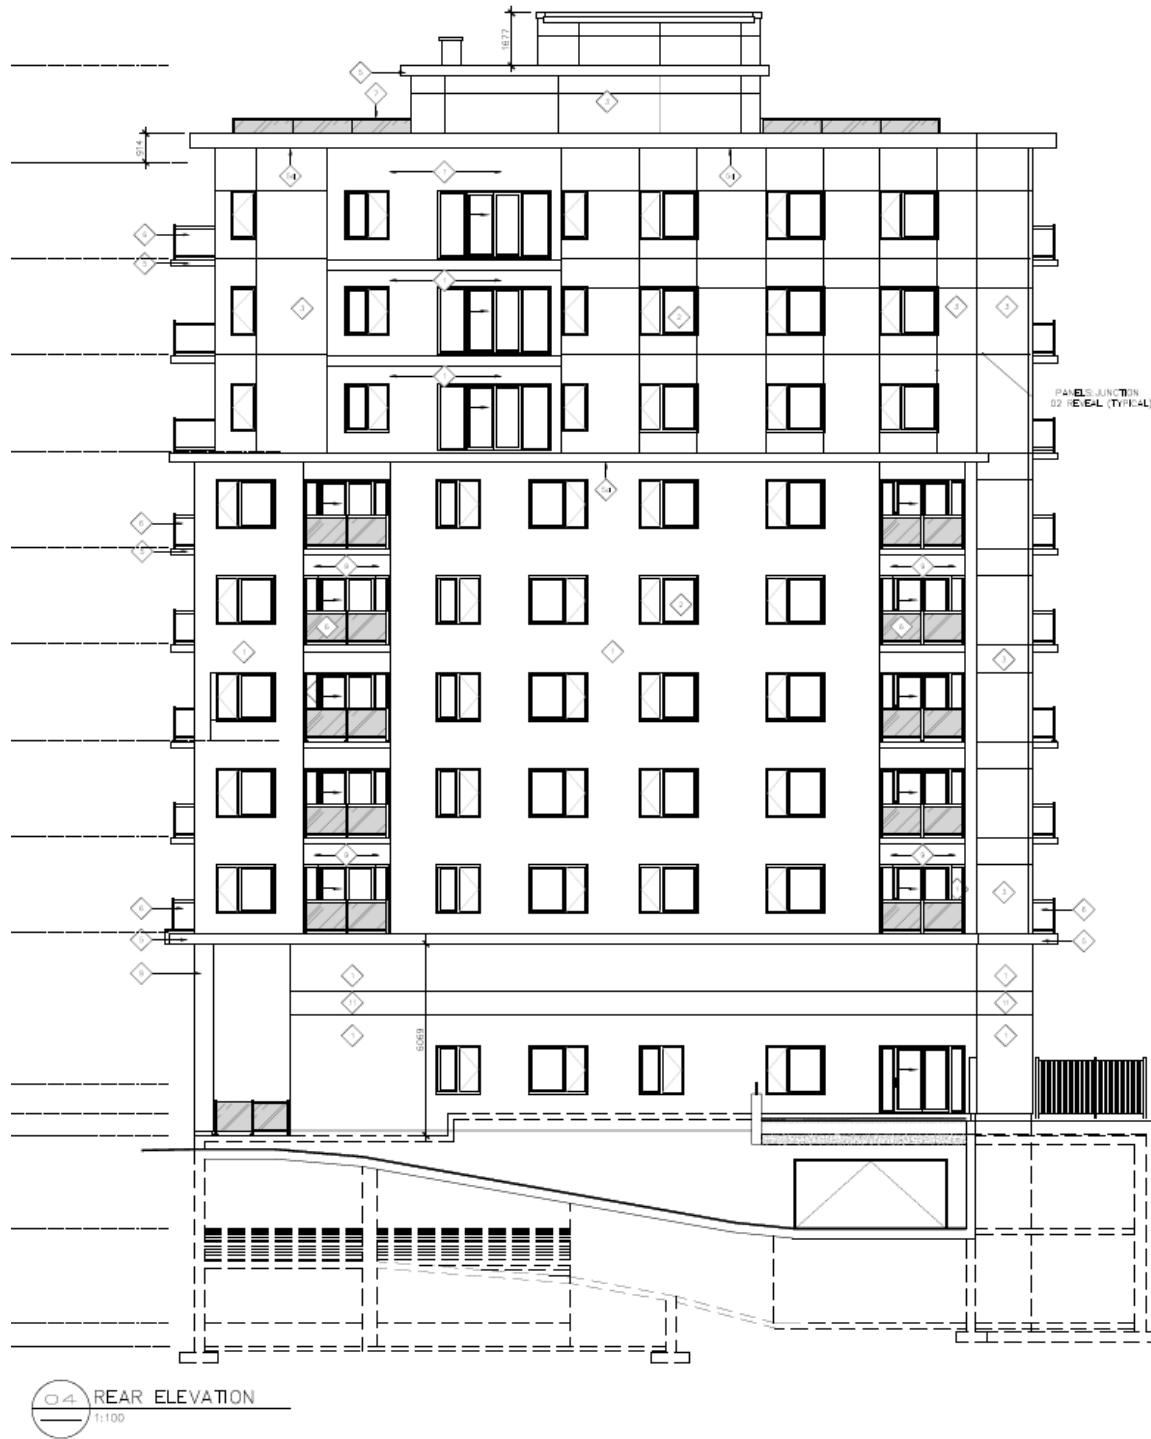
Proposed Building Elevation – East Elevation (Yves Lussier Architect, October 27, 2022)
